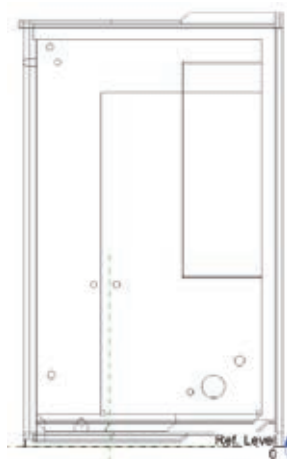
Elevation View of Volumetric Precast Concrete Unit
